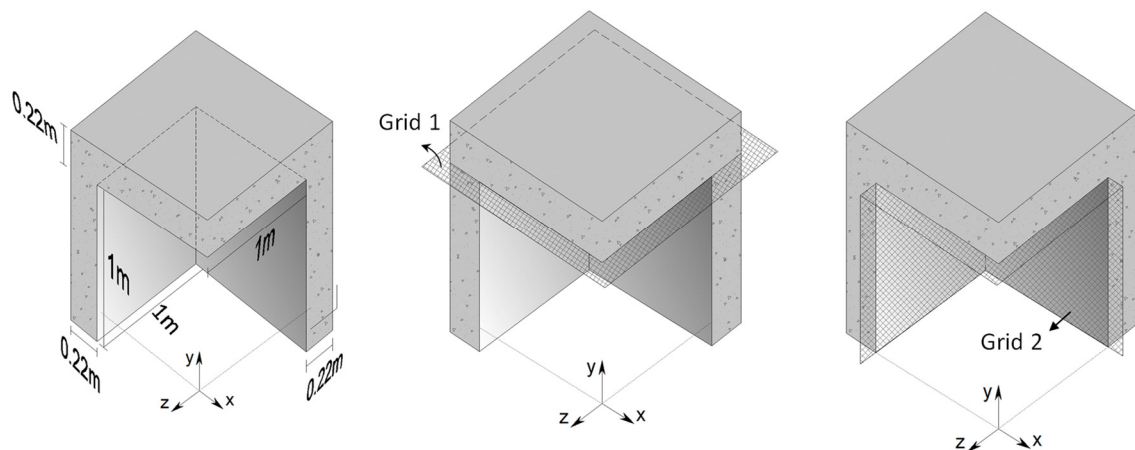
3D concrete building corner dimensions and scheme of the receivers' grids.
